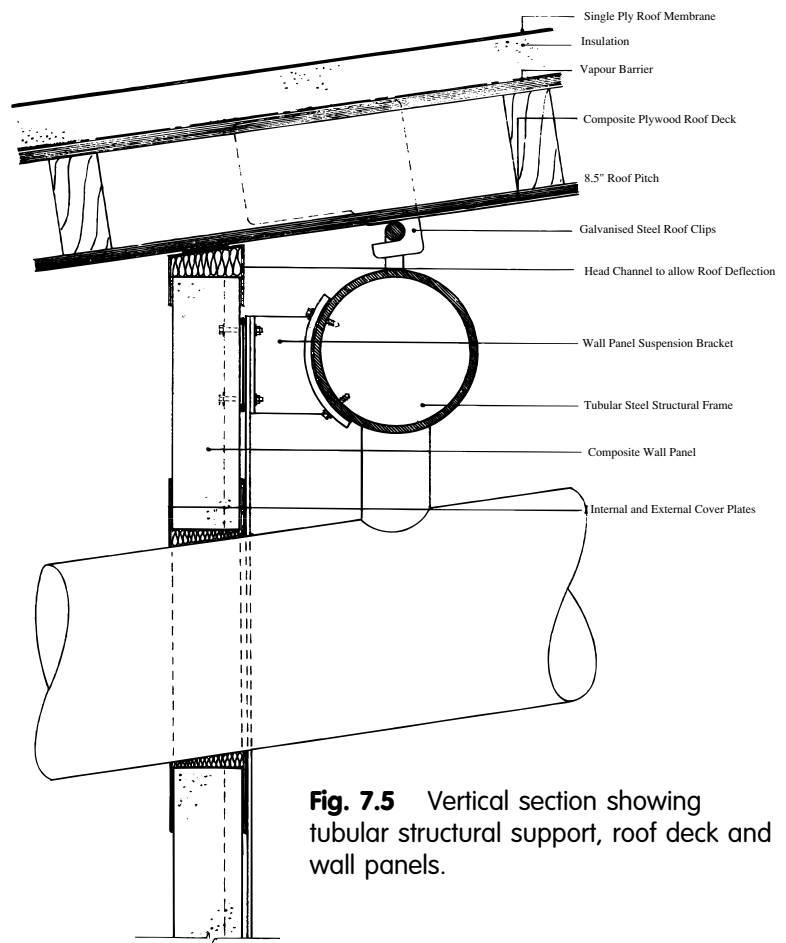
Vertical section showing tubular structural support, roof deck and wall panels.
